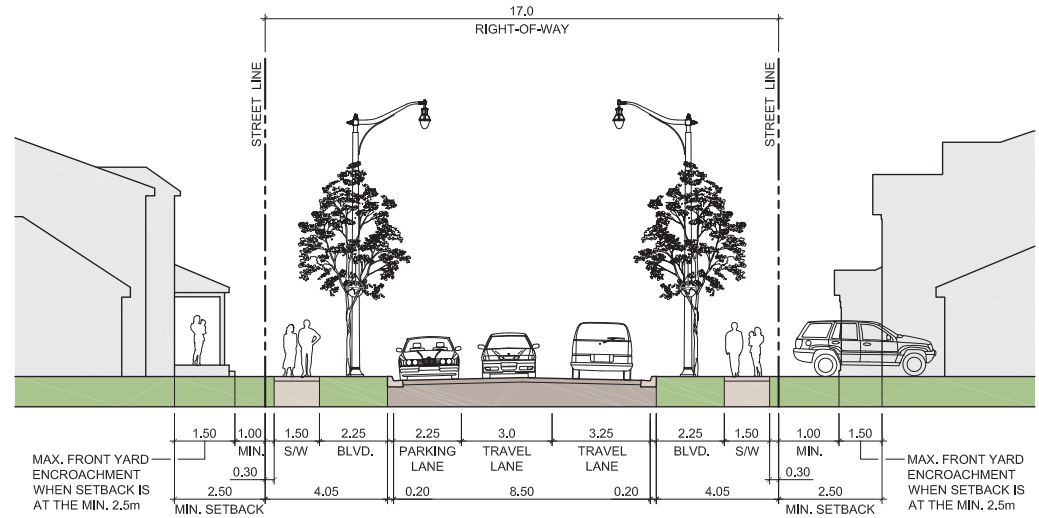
Low Density Residential / Local Road Streetscape - 17.0m R.O.W. / 2 travel lanes / on-street parking on one side / 4.05m boulevard.
